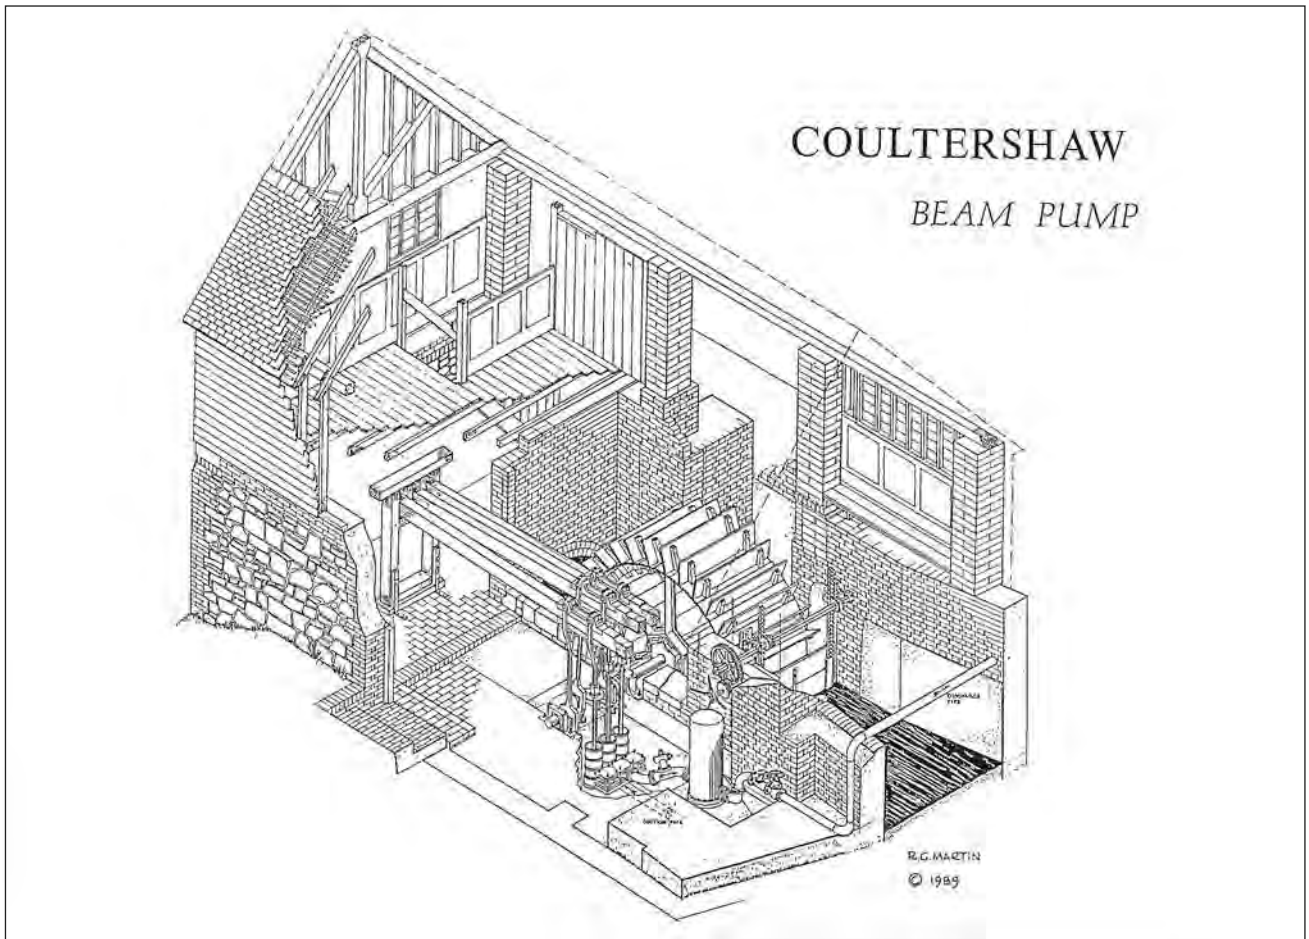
Isometric drawing of Coultershaw Beam Pump by Ron Martin
